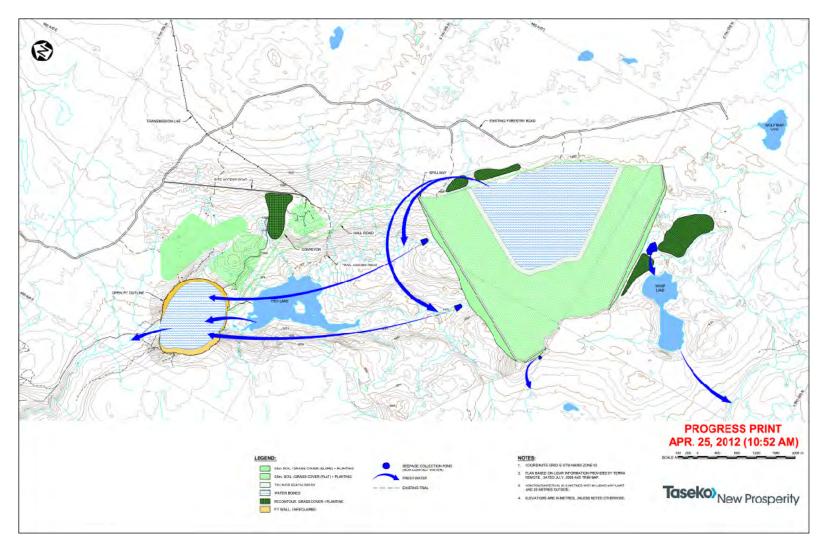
A-8 Water Management – Final Reclamation Plan
